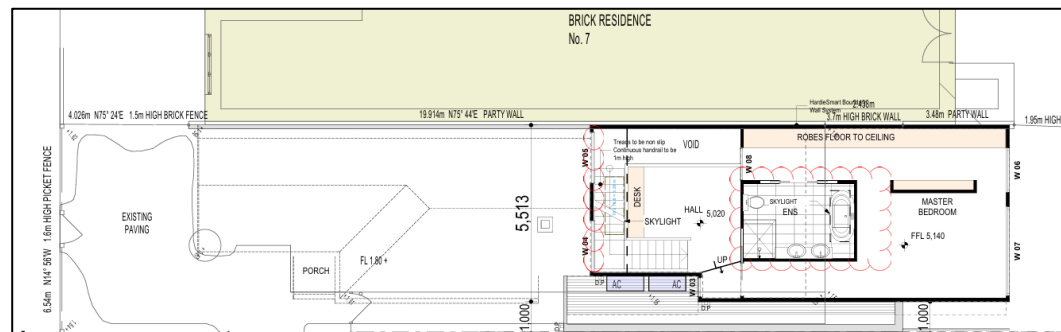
Extract of the endorsed first floor plan of 8 Lytton Street Elwood, illustrating a double storey boundary wall approved along the northern boundary abutting 7 Lytton Street (Source: Endorsed Plans, 8 March 2017)
